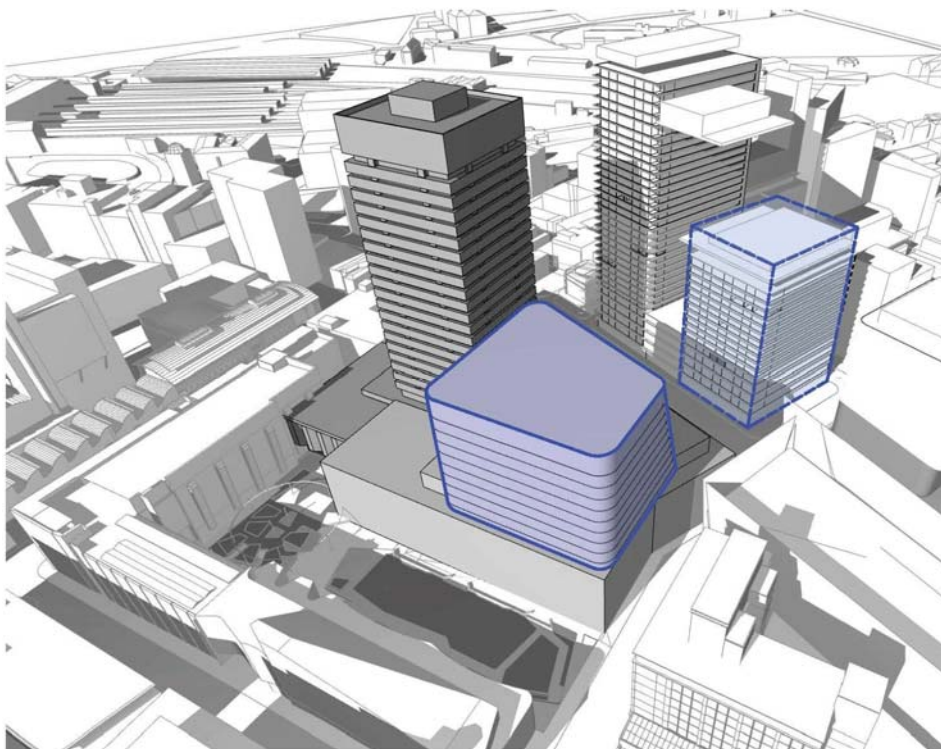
Relationship – One Central Park West and Proposed modified Building 2
